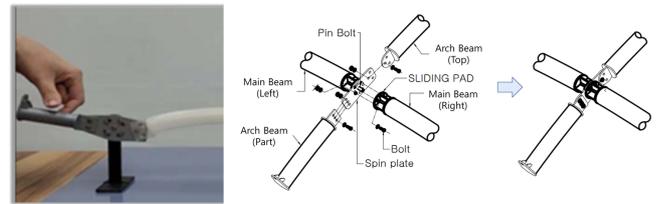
Disassembly and assembly diagram of patented component using rotating body steel plate slit
